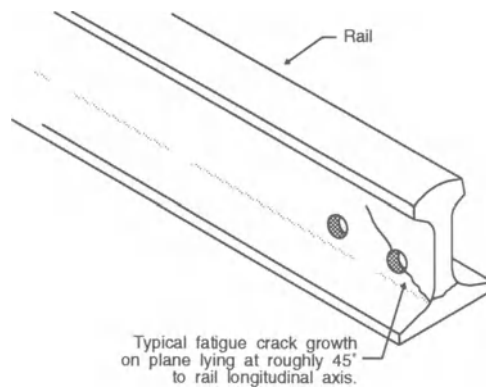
Typical Cracks Originating at Rail-End Bolt Hole
